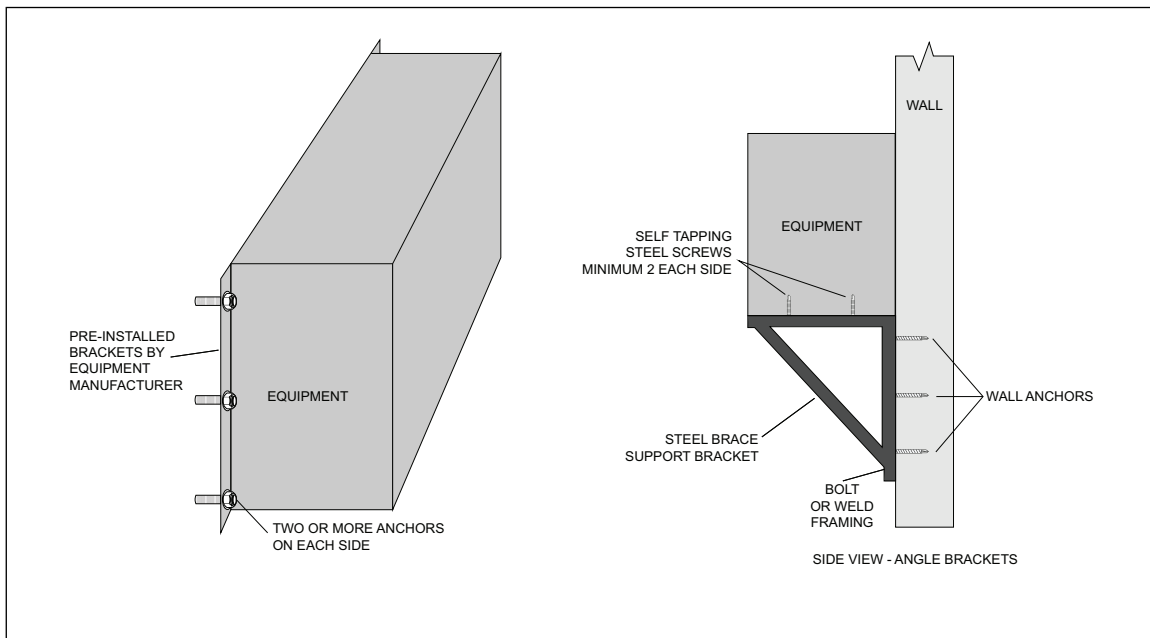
A. Example of equipment attached directly to wall or supported by additional steel members (Figures 123 and 124 from FEMA 413)
